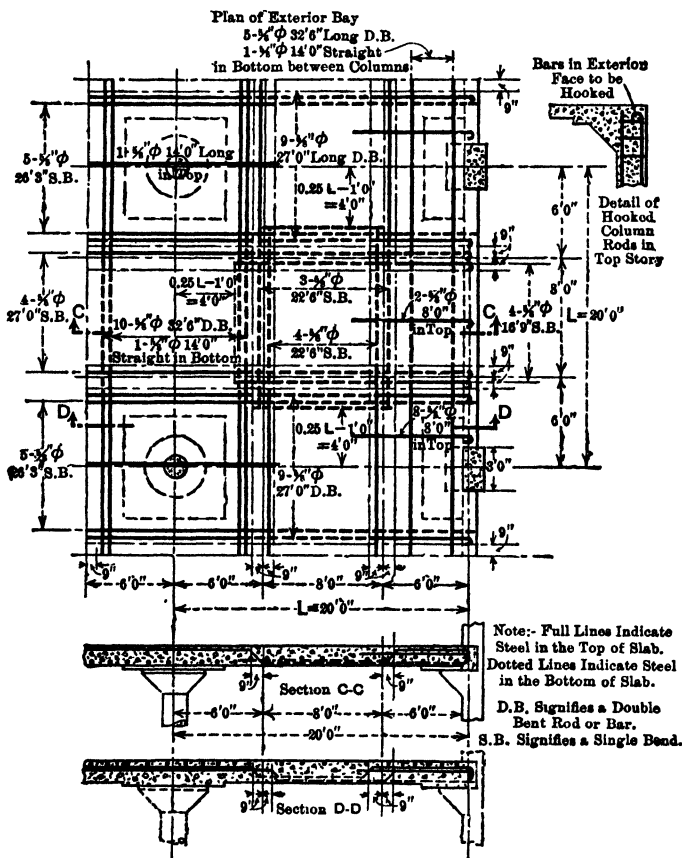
Flat Slab Construction. Details of Reinforcement for a Typical Exterior Panel
